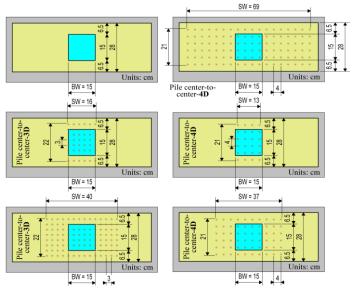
Top view of tests conditions (small-scale 1-g model tests)
